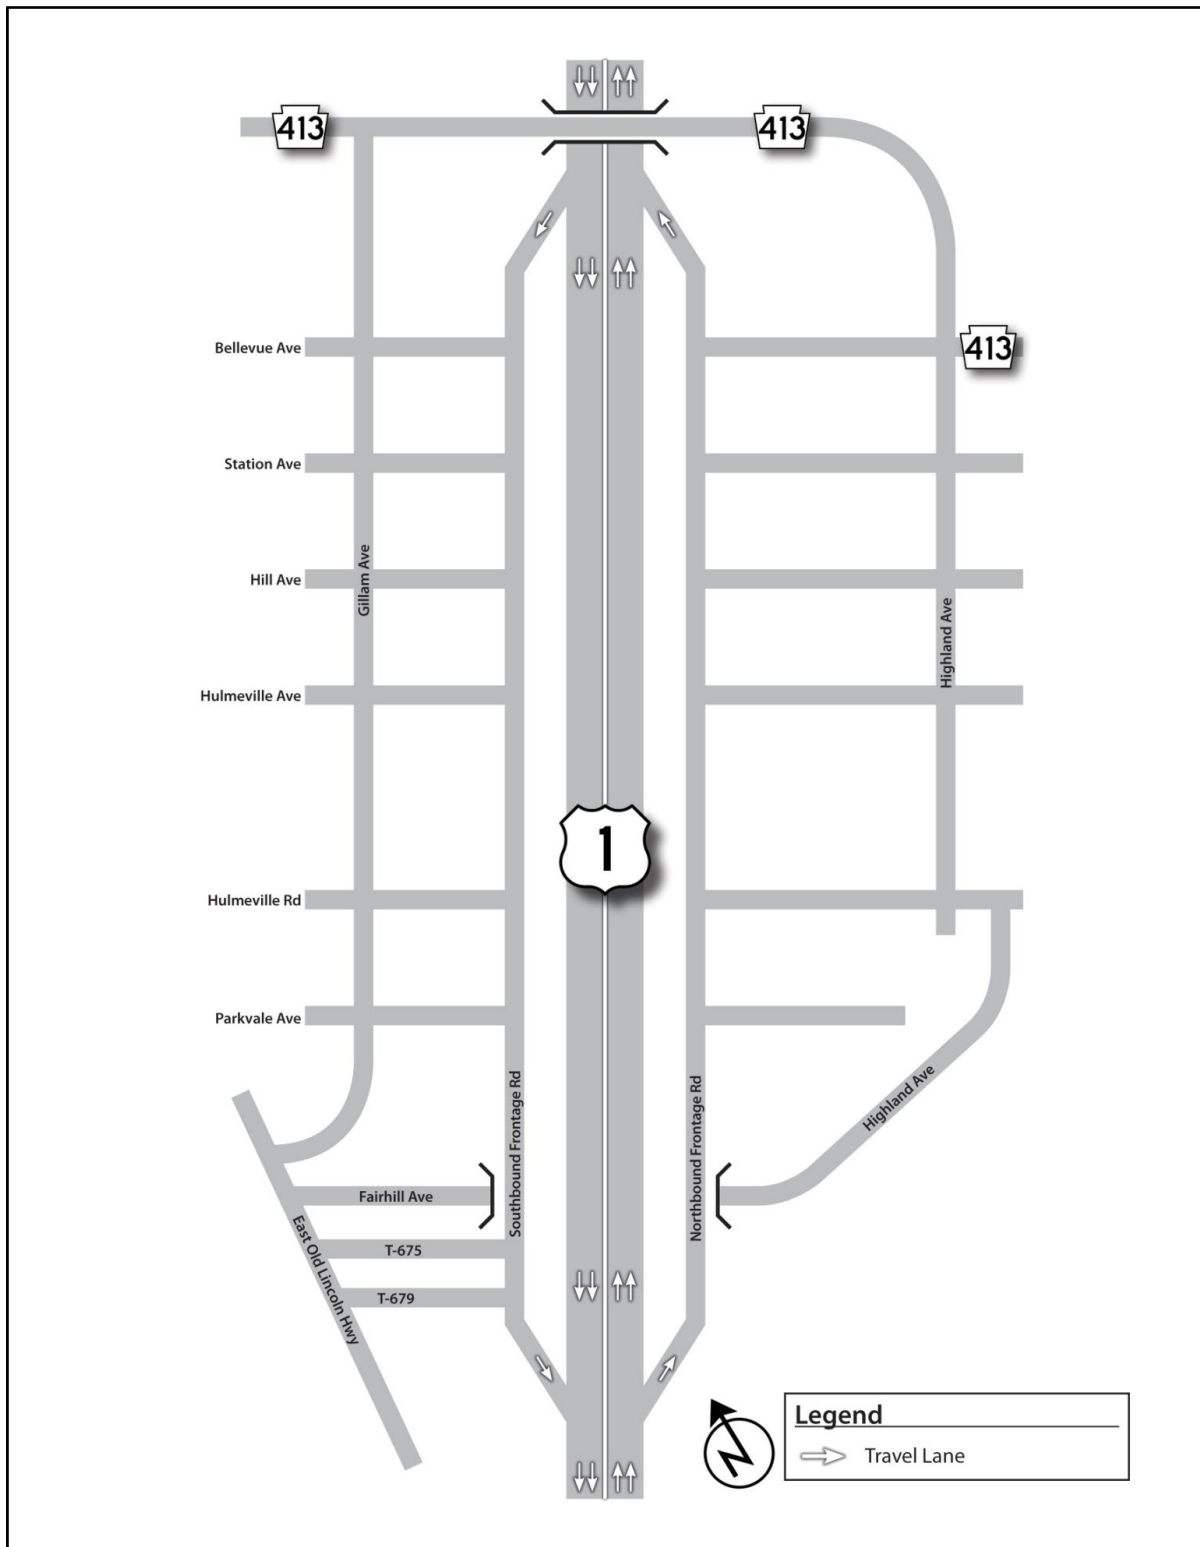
PROPOSED U.S. 1/FRONTAGE ROAD SYSTEM CONFIGURATION
